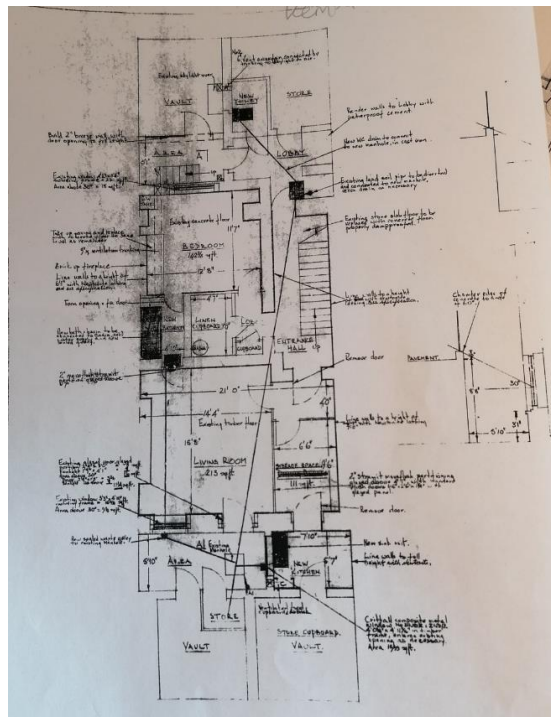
Drainage Plan for 14 John Street (1964) [© Camden Local Studies and Archives Centre]
